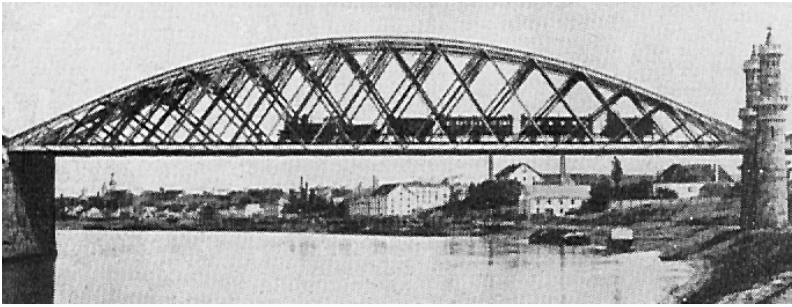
Railway bridge at Rieza in Saxony, Germany.
